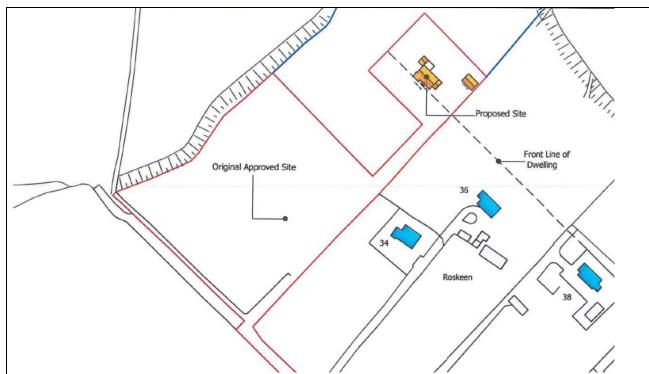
Current site location plan showing approx. location of previously approved dwelling and garage; and location of the change of house type including garage proposed.
